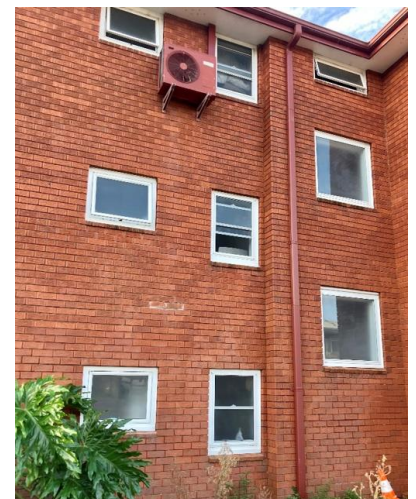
Northern elevation of 32 Croydon St, showing windows facing
